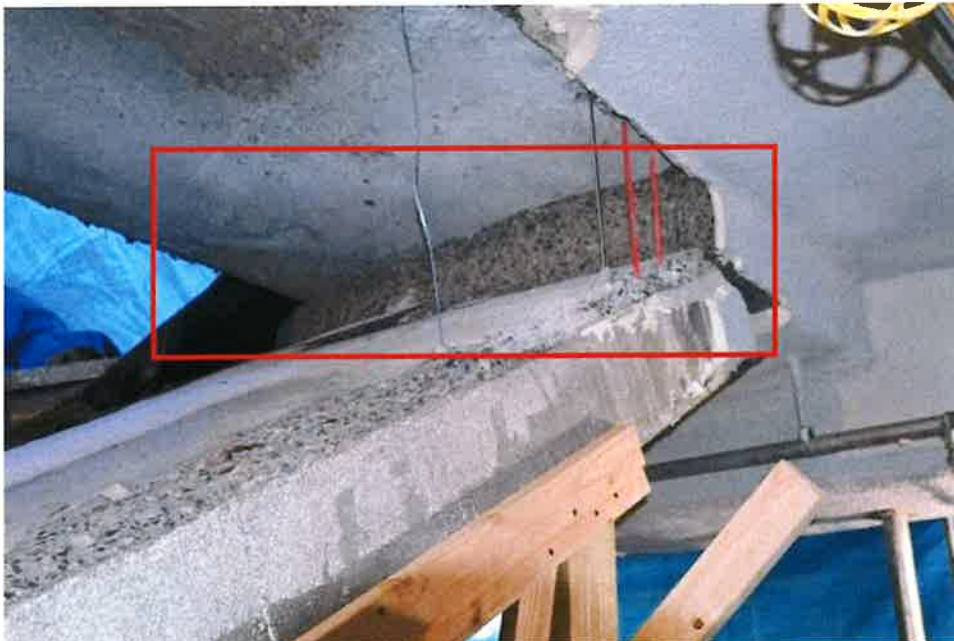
No top reinforcement at failure plane Northwest Portion of Collapsed Slab
